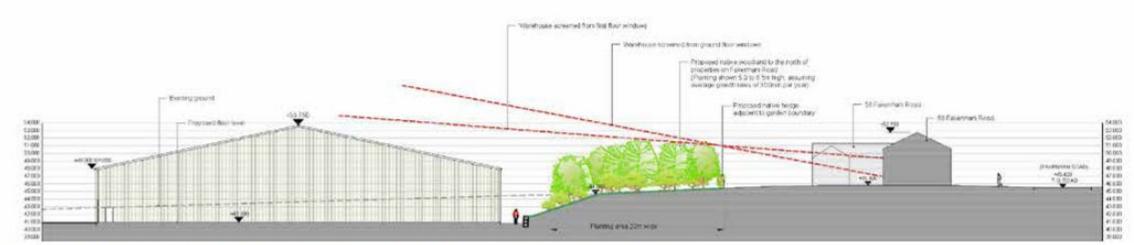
Section showing the proposed native woodland between the proposed warehouse and the properties on Fakenham Road, year 15.
